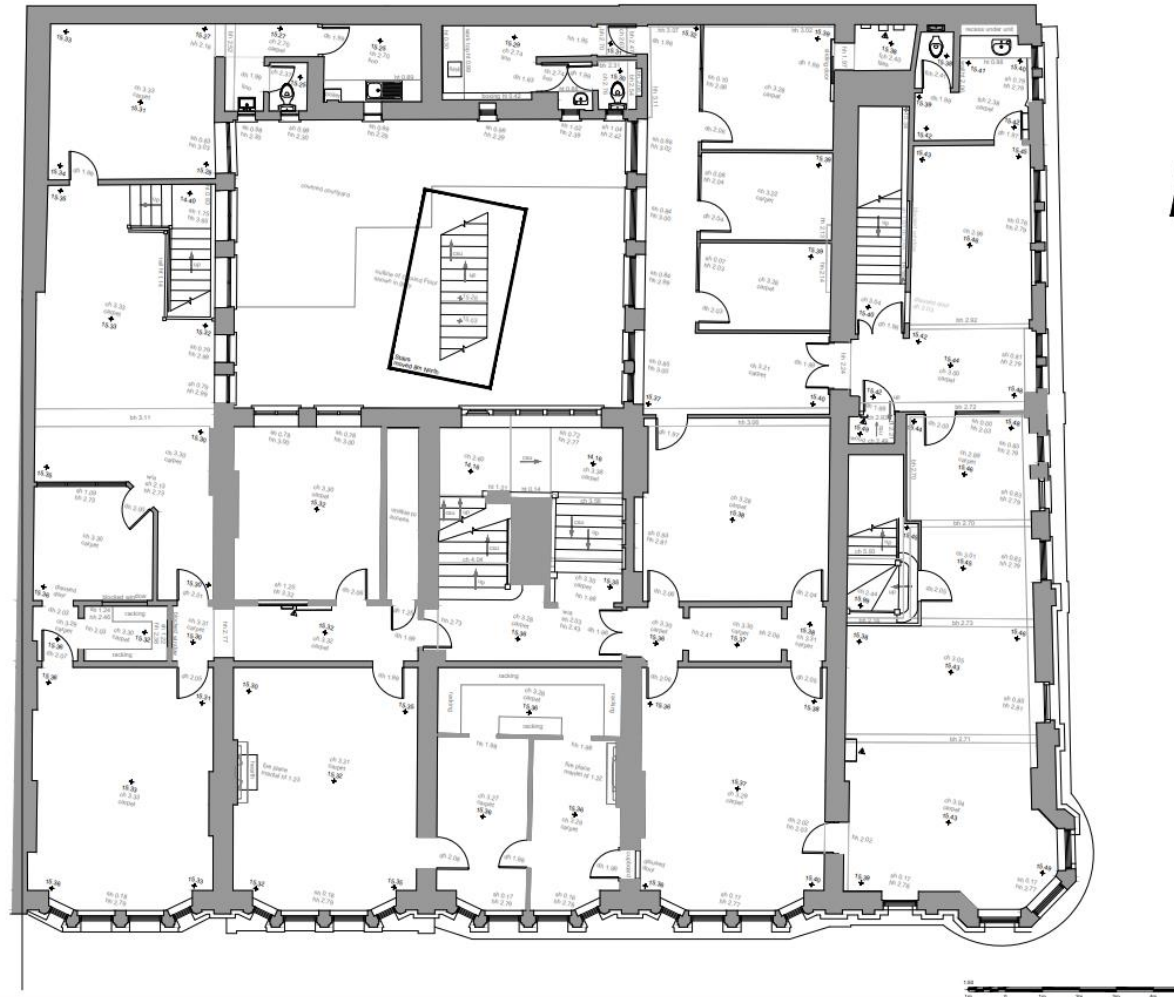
Existing Plan of the First Floor (reproduced courtesy of the client).
